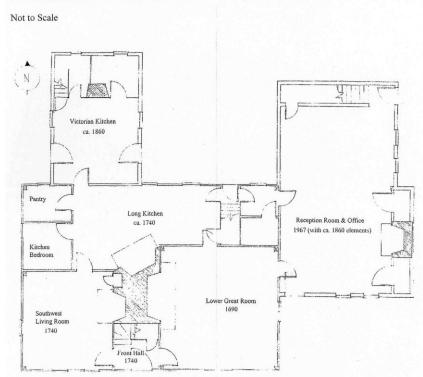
First floor plan of the Wilbor house (Fields 2006)
